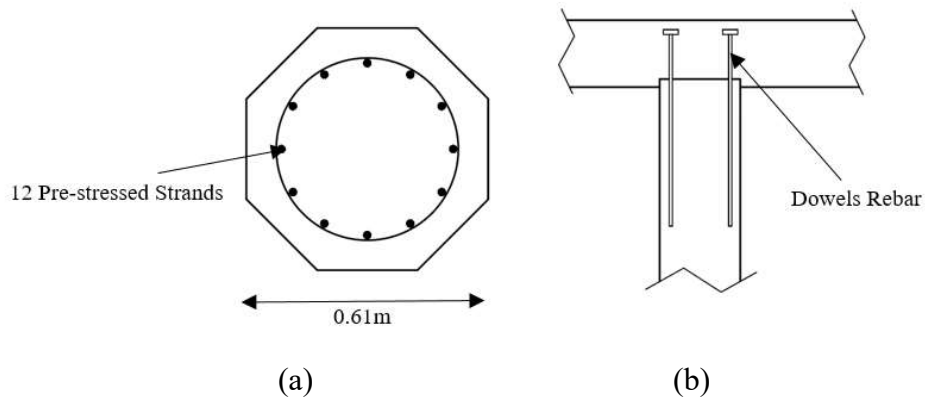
Pile details: (a) pile geometry section; (b) T-head dowels in pile connection.
